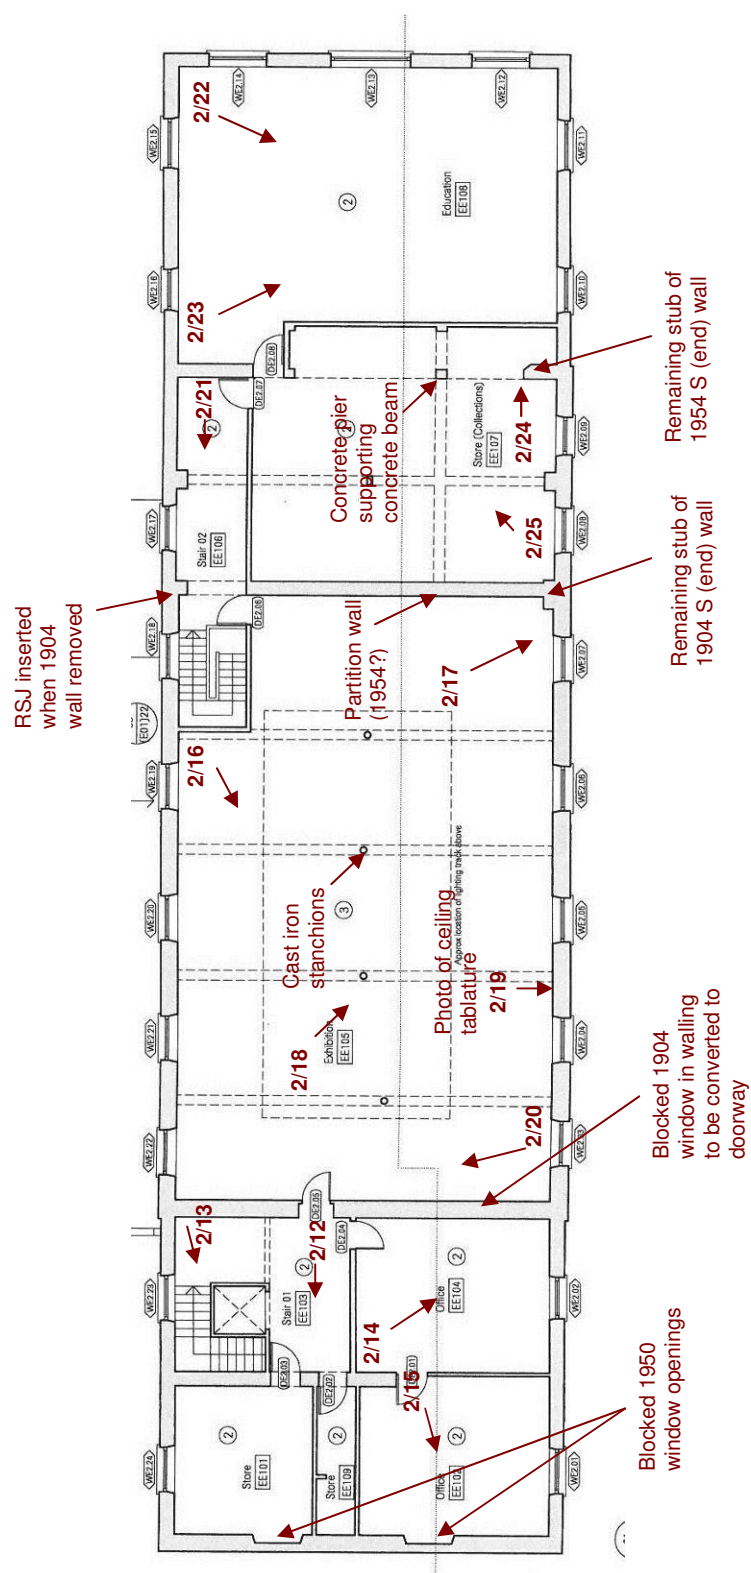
Eastern House (first floor) – black & white photo locations and direction of shot, 13/02/2012 (Long & Kentish architects' base plan
